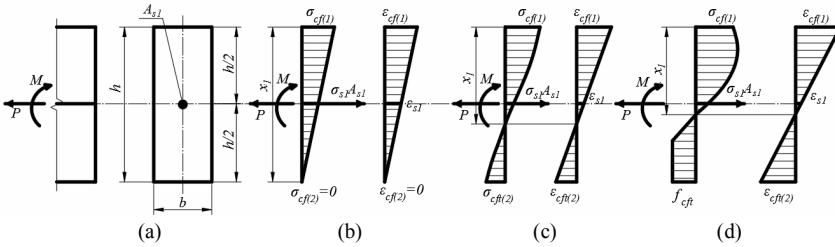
Stress-strain state of a rectangular steel-fiber-concrete section with pre-stressed reinforcement in the center of the section under the action of bending moment: (a) - cross section of the element; (b) - diagram of stresses and strains under the action of bending moment and compressive force at stage I; (c) - plot of stresses and strains under the action of bending moment and compressive force at stage II (stage of crack formation); (d) - diagram of stresses and strains under the action of bending moment and compressive force at stage III (stage of destruction)
